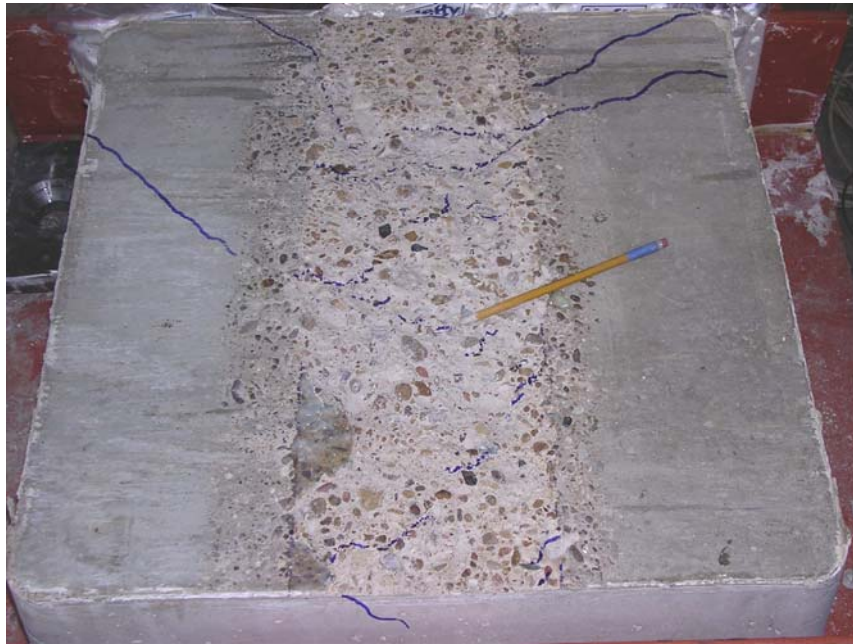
Typical failure of Epoxy Plate specimen (cracks marked in blue)
